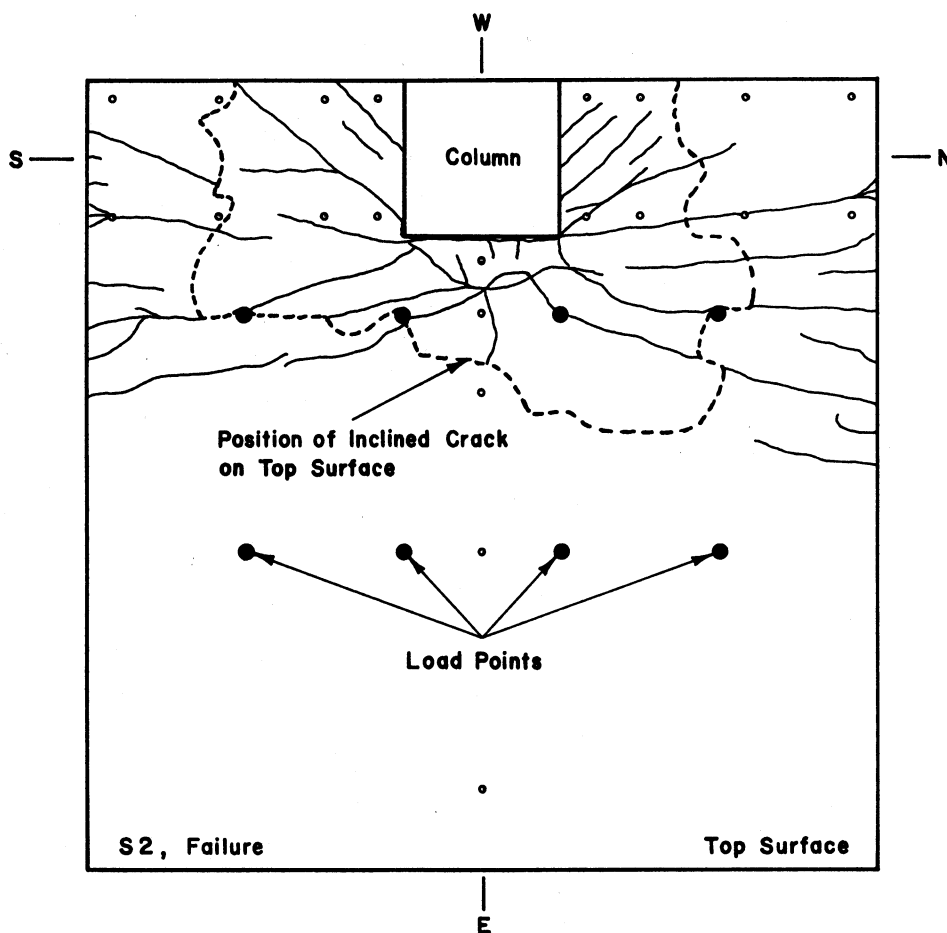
Crack pattern at failure on the top surface of Specimen S2
